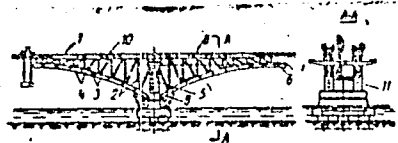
1 - upper string of the cantilever truss; 2 - struts; 3 - slanting members; 4 - lower string panels; 5 - anchor post; 6 - key block; 7 - floor plates; 8 - cables; 9 - anchor block; 10 - tension cables; 11 - joints.
